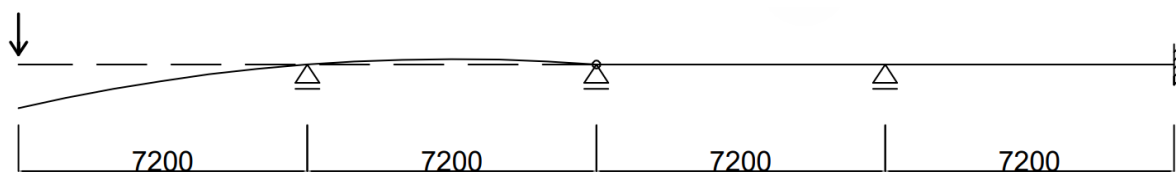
Corner column removed, double span beams supported by hinged connections, situation 2
